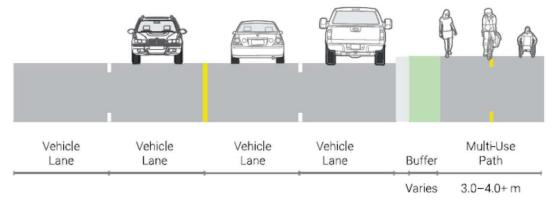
Cross-Section of In-Boulevard Multi-Use Path
